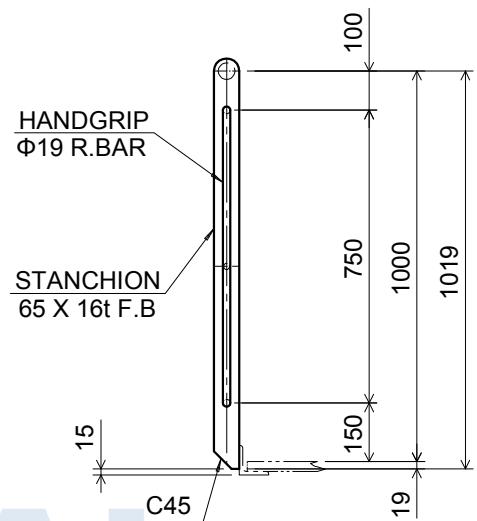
DETAIL OF HANDRAIL STANCHION FOR PLATFORM
